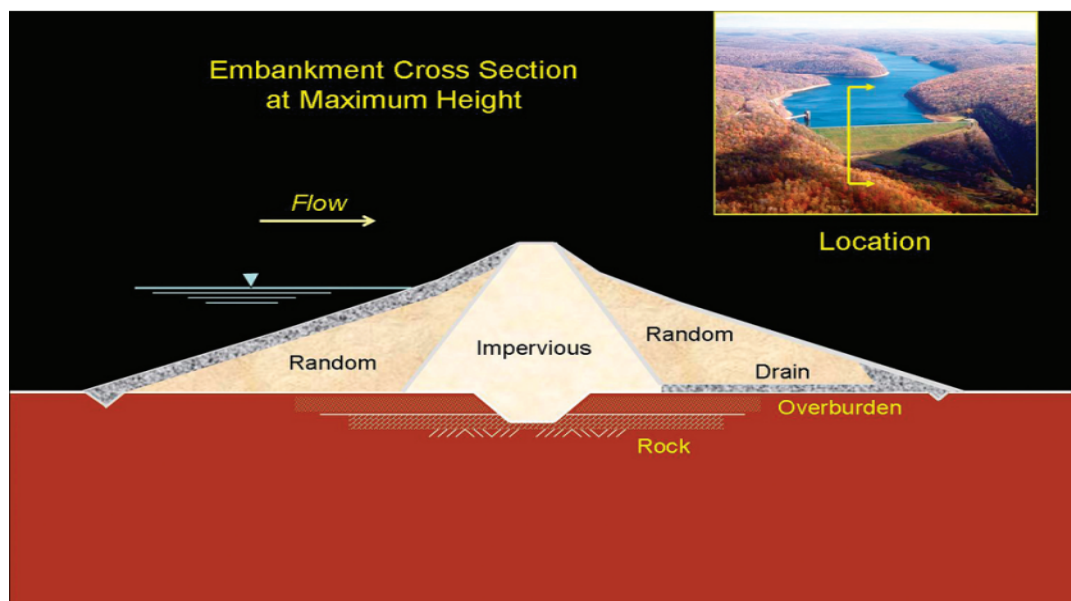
Typical cross section of embankment dam (Greene et al. 2010)
